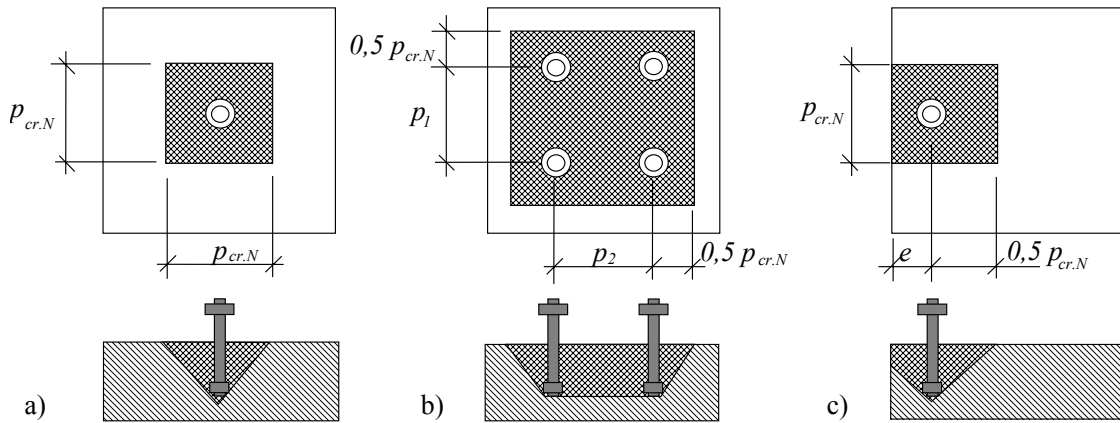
An idealised concrete cone, individual anchor a), anchor group b), single anchor at edge c)
